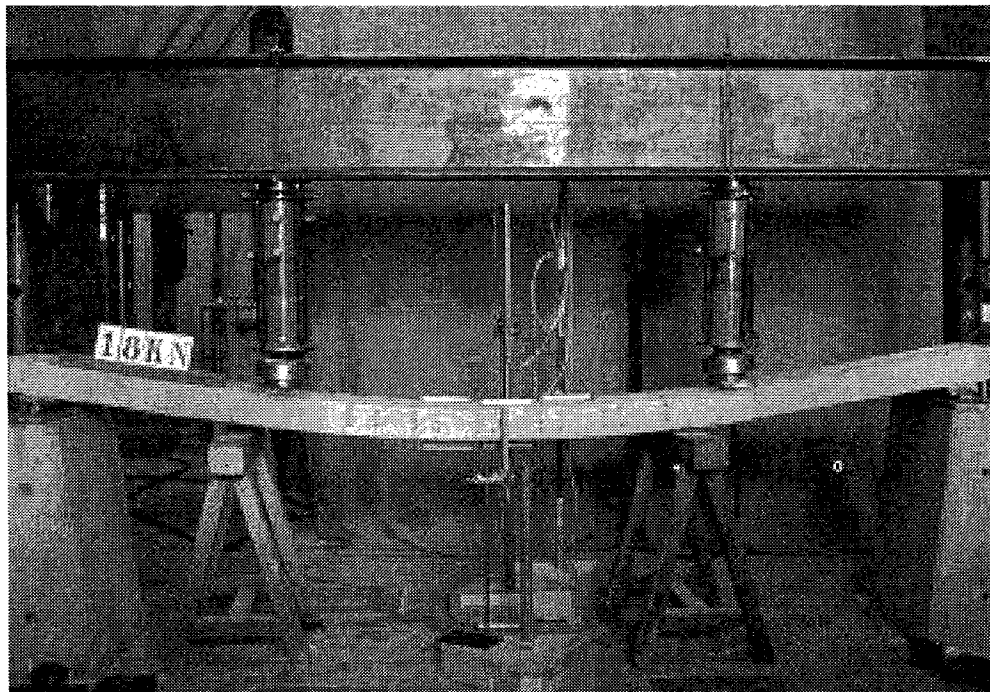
Concrete Slab Prestressed with Aramid FRP Bars [77].
